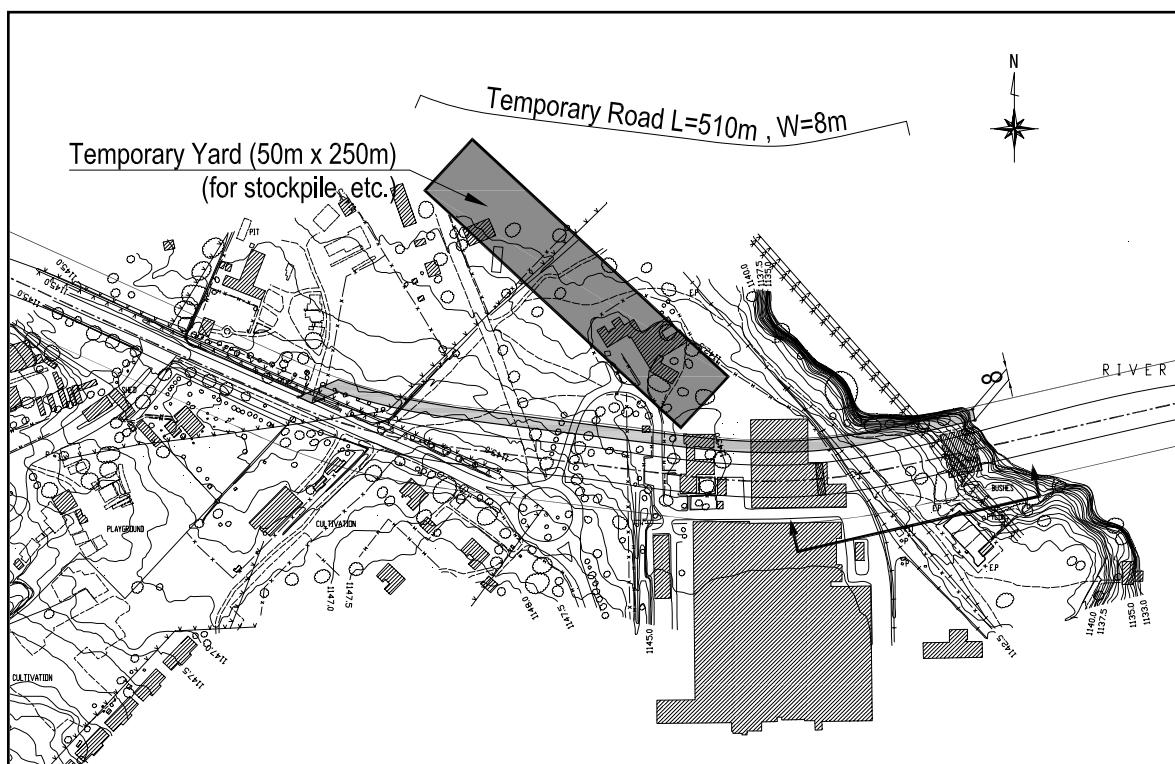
Location of Temporary Road and Yard at Njeru side
